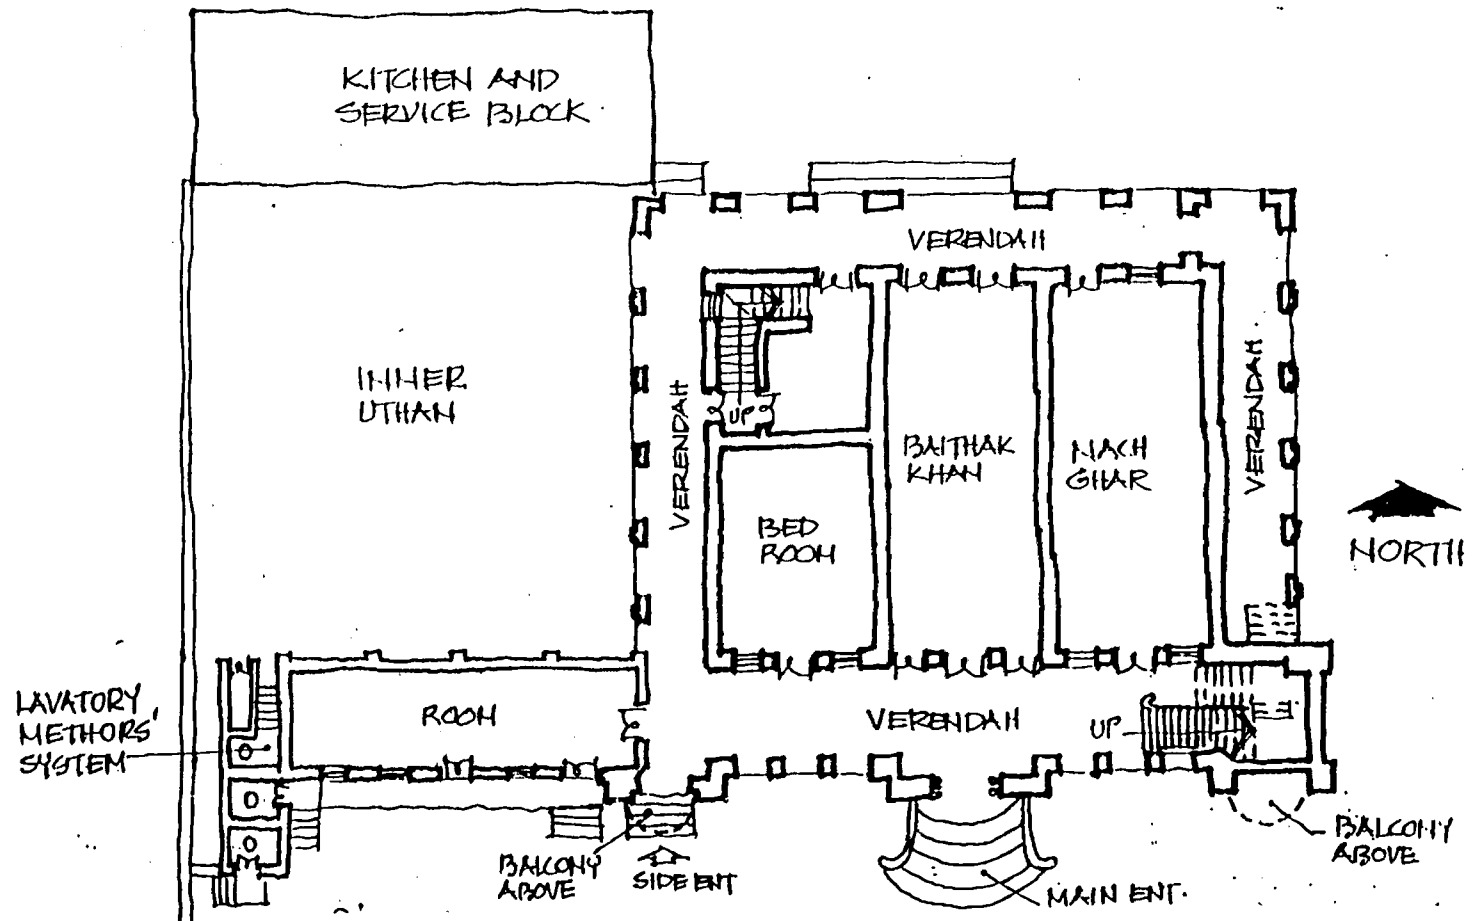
Ground floor plan, Bhojahari Lodge, Tipu Sultan road, Dhaka
